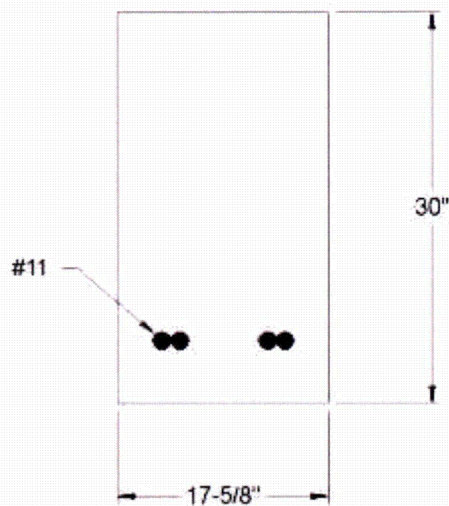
Cross Section of Proposed Specimens (in casting position – specimen shall be rotated 180 deg. for testing)
